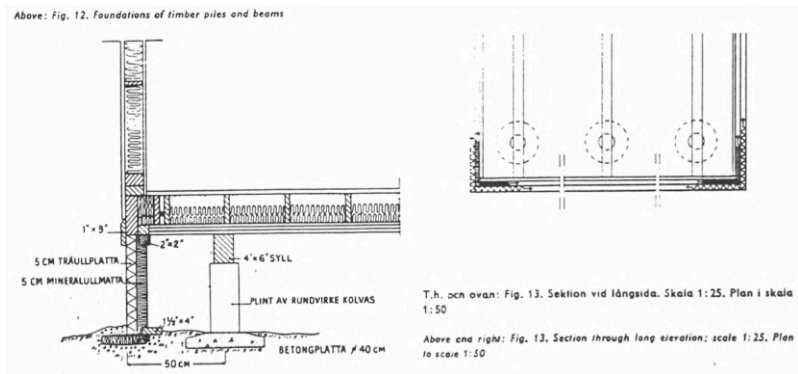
Constructive drawings of a *skivhus* internal structure.
